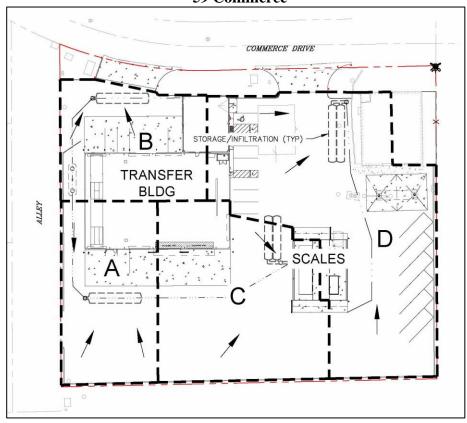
Figure A – Drainage Sheds, Proposed Conditions 59 Commerce
